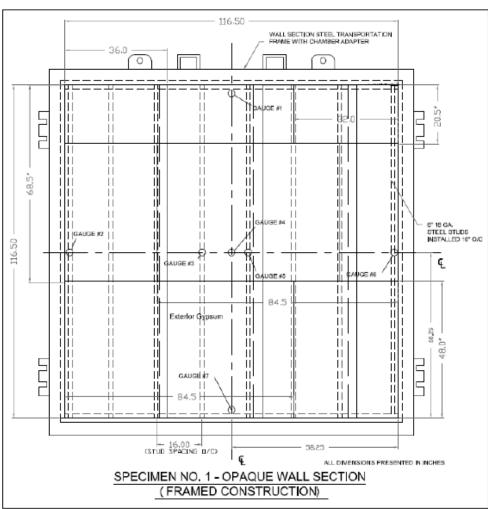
Element Specimen 20-06-B0040-SS-OP-1 Gauge Locations
